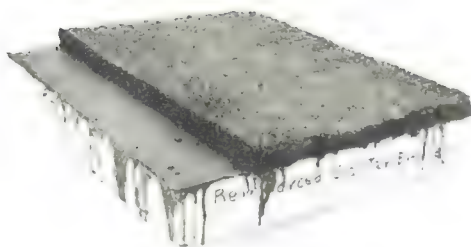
Laboratory test of bridge deck coating on 3- by 18- by 24-in. concrete block.
